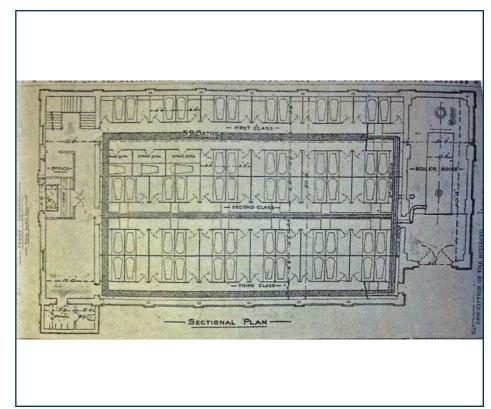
Original layout of washing baths in 1989.(Note stairs in top corner)
